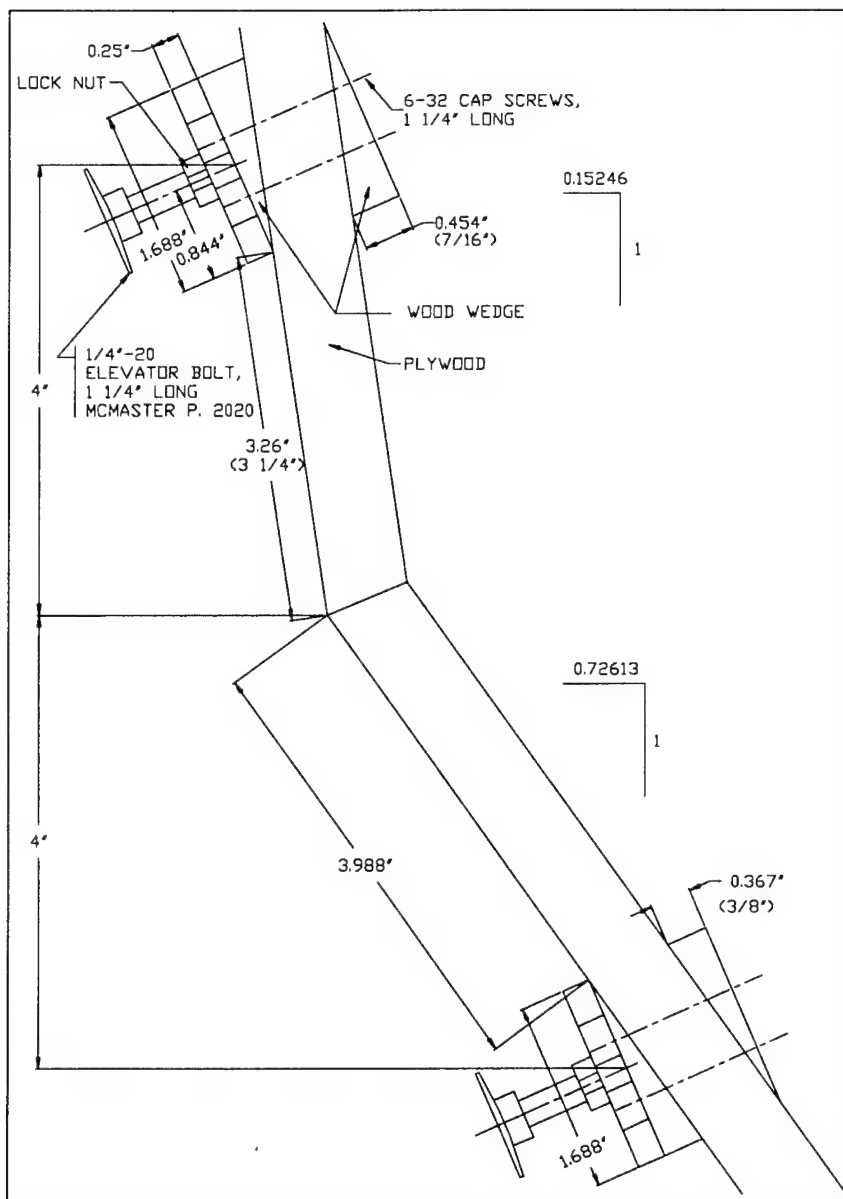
Elevation cross-section view of LVDT plates at change in slope, downstream face.
